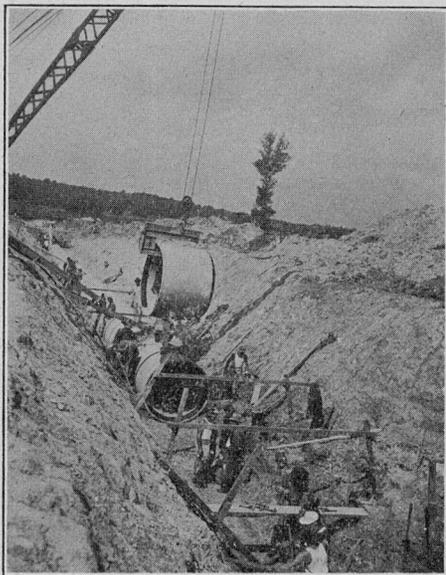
LOWERING 60-INCH CONCRETE PIPE INTO TRENCH.
